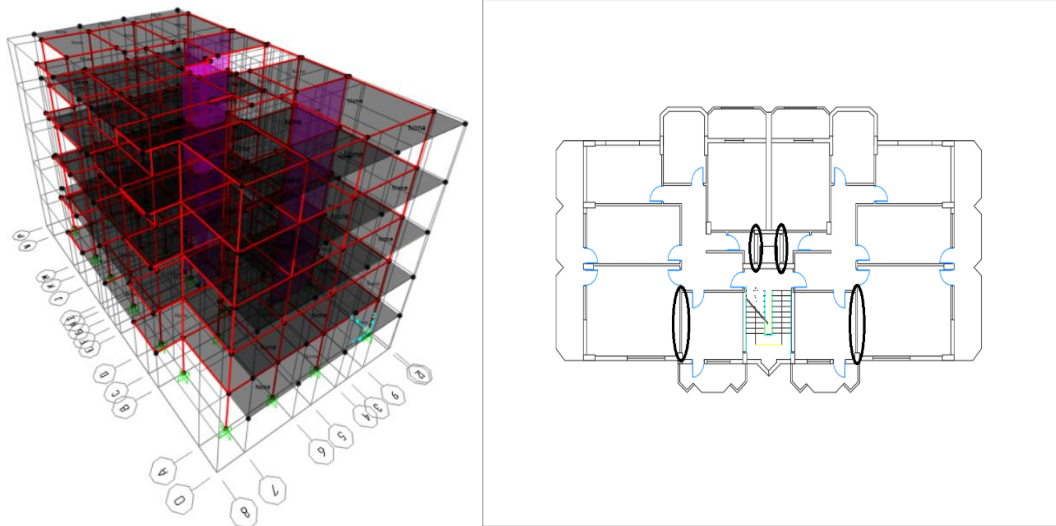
Second shear wall configuration used for strengthening (shear wall-II).
